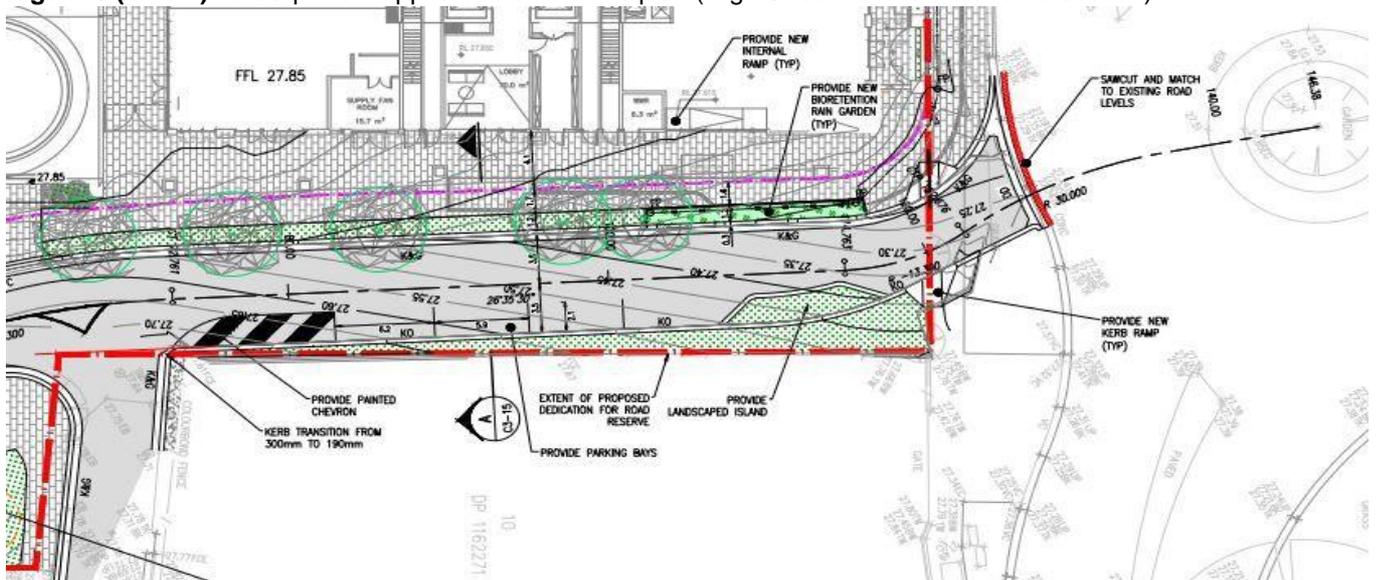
(below): Excerpt from applicant's civil works plan (High Street and new road intersection).
